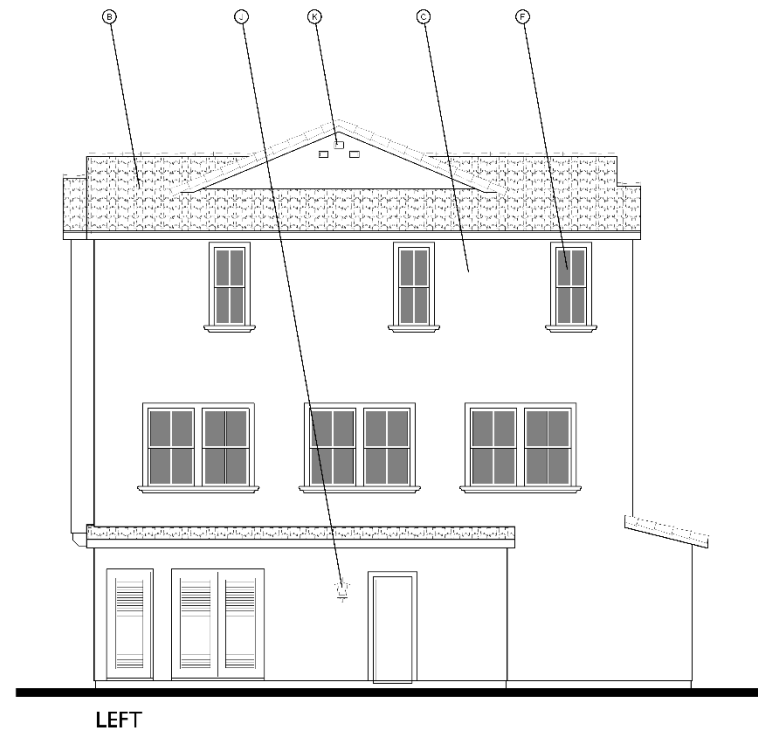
Spanish Colonial Elevation - Townhome (5-Plex) – Side
